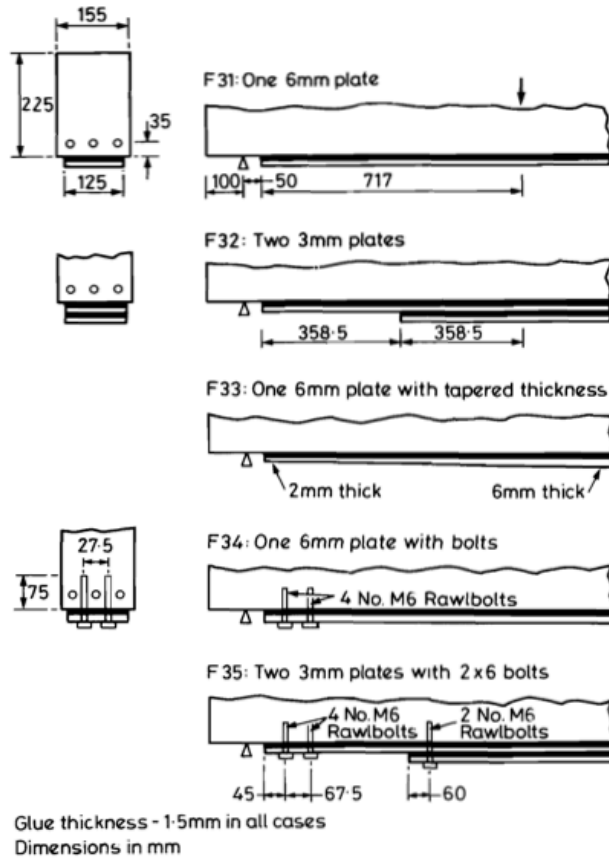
26- Plating details: beams F31-F35 (Jones et al. 1988).
